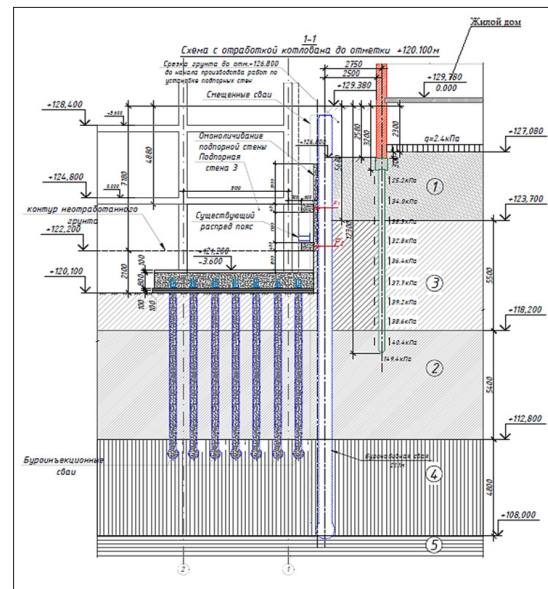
Junction of the monolithic reinforced concrete buttress structures with the existing pile foundation of a residential building
